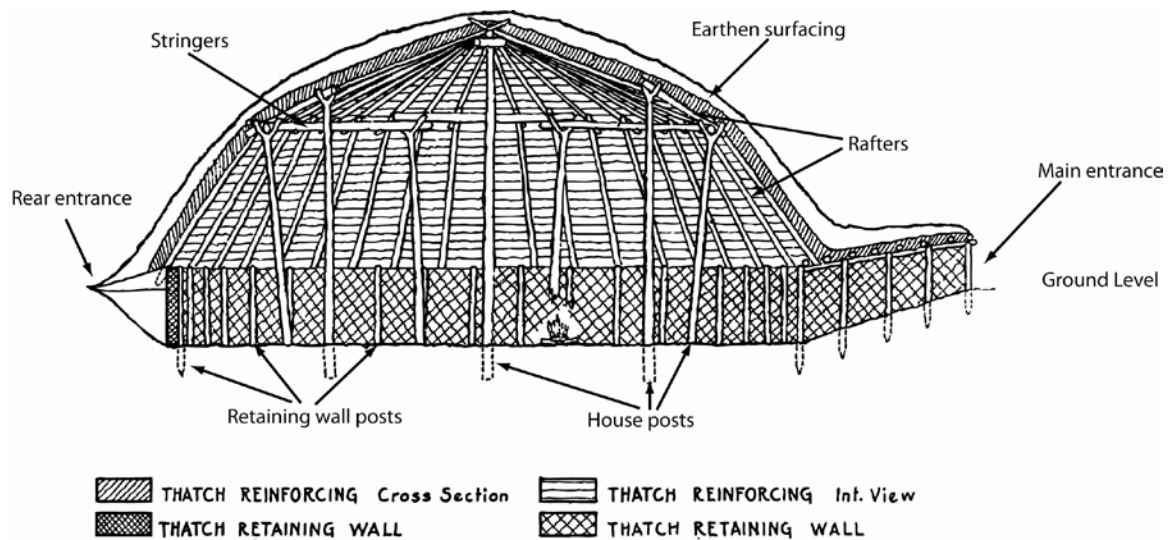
Patwin dance house cross section (adapted from McKern 1923:163.)
